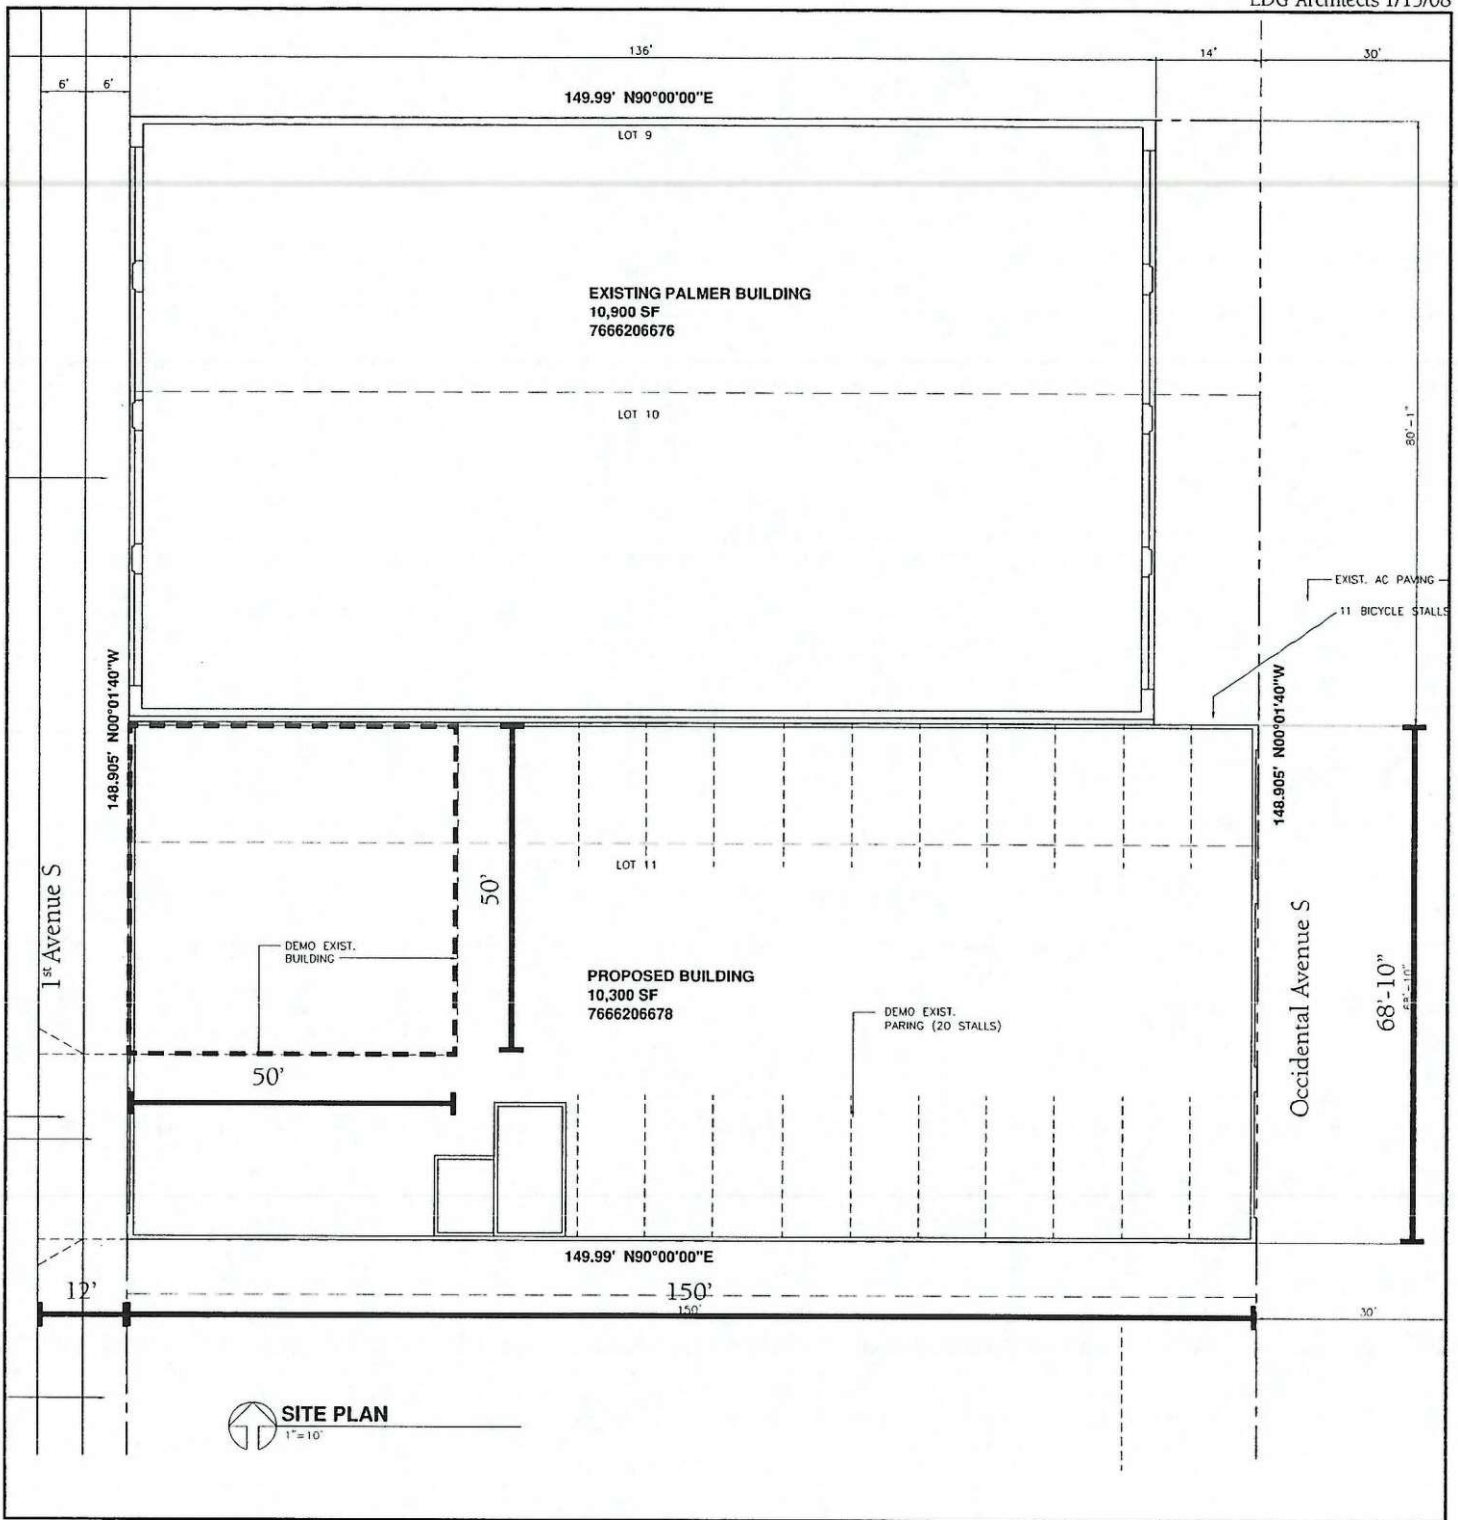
• Site Plan of proposed development showing existing building as dashed line in western portion of site.
